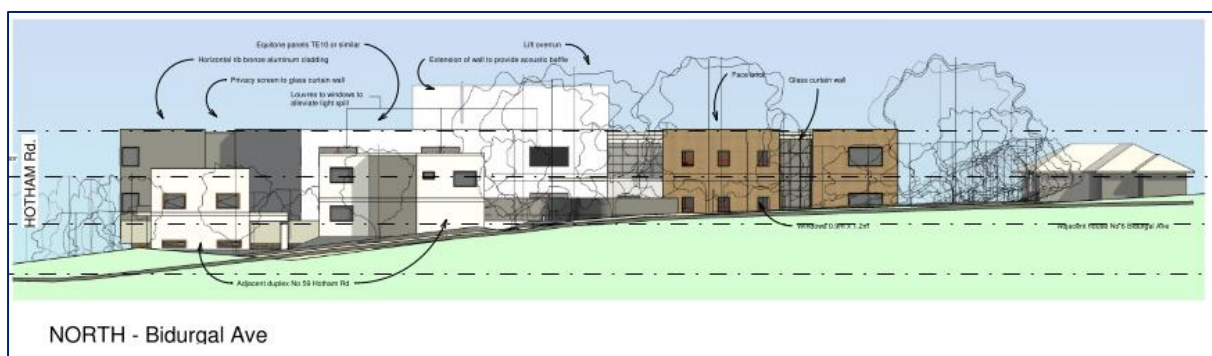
| Proposed building elevation Bidurgal Avenue (Source: EIS(RFI) 2022)
